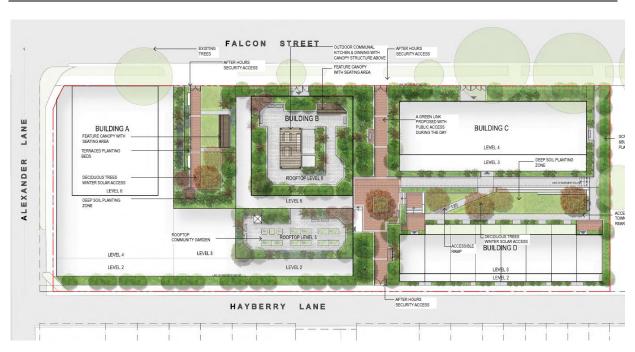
Indicative landscape plan showing elevated roof top communal spaces
